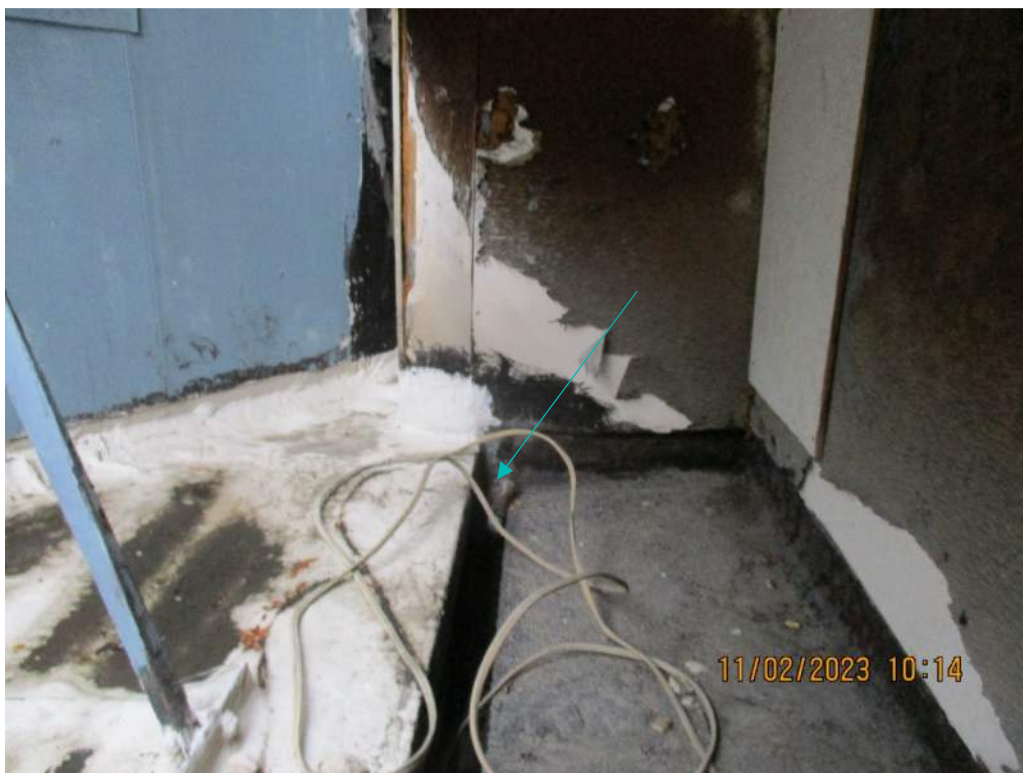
Location of Small Drain Outlet in East Corner of Internal Gutter
